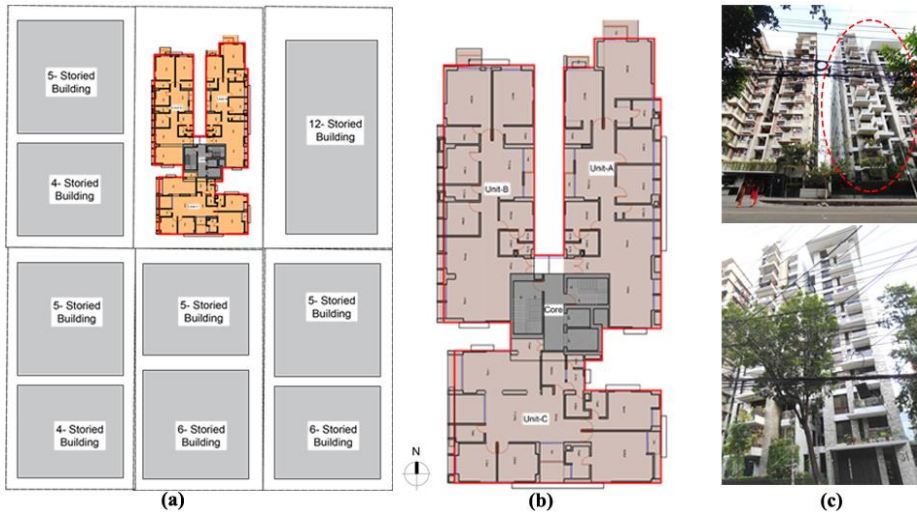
(a) Site plan, (b) Floor plan, (c) Images of the 13- storied case apartment building.
